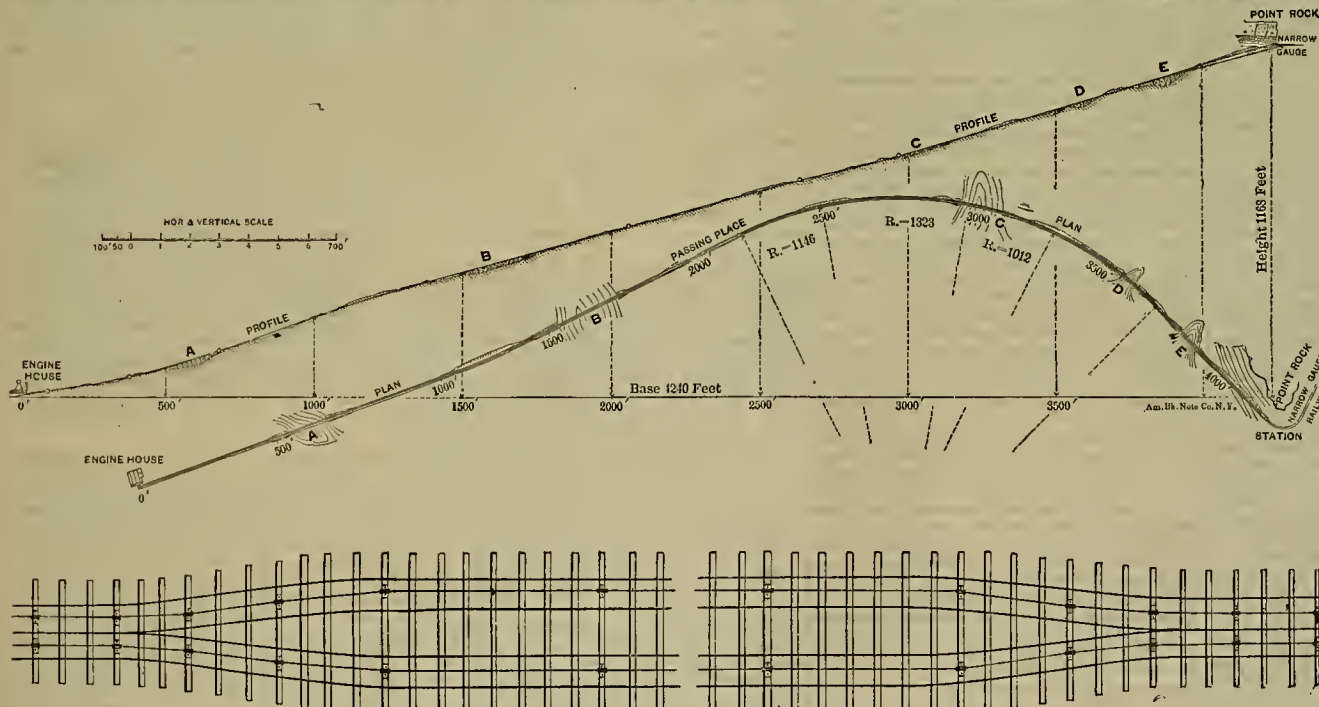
AND 2.—LOOKOUT MOUNTAIN RAILWAY IN PLAN AND PROFILE.
